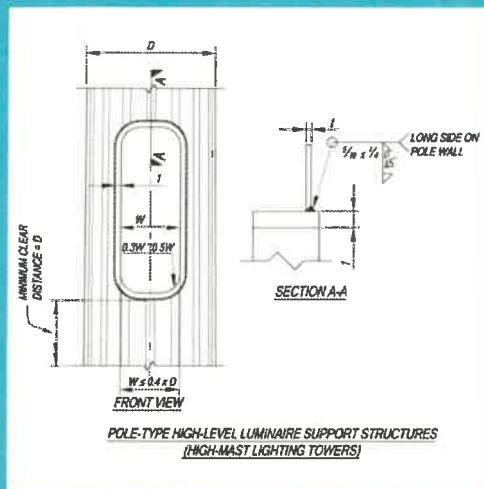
Details of Reinforced Holes and Cutouts for High-Mast Poles
